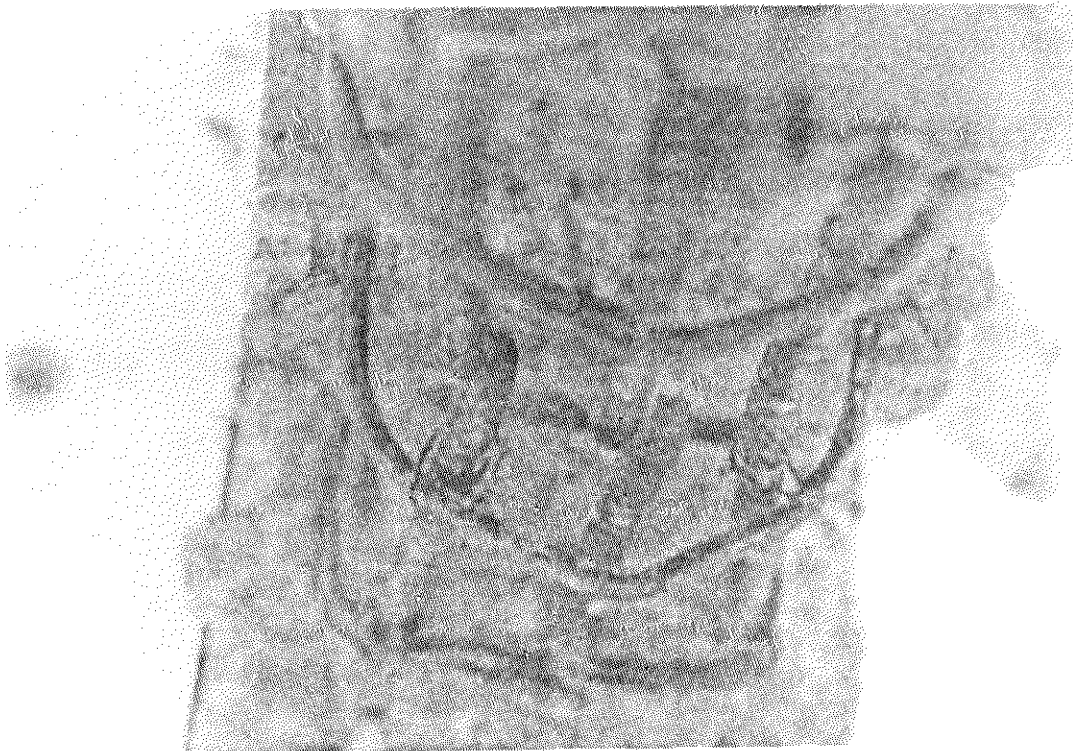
(b) Distorted Stirrups due to Severe Buckling, Beam F-2
